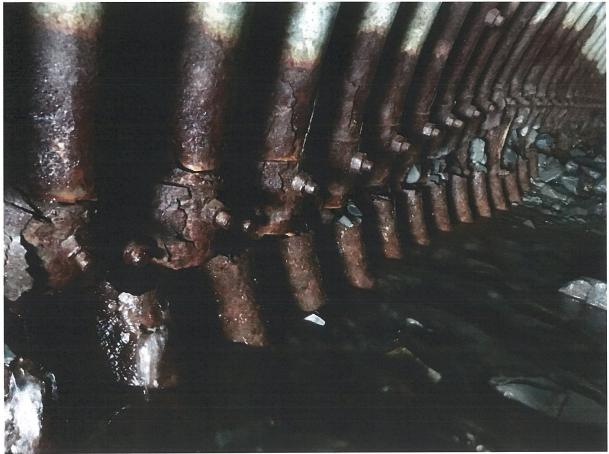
MP 12.9, left culvert interior. August 22, 2018.
